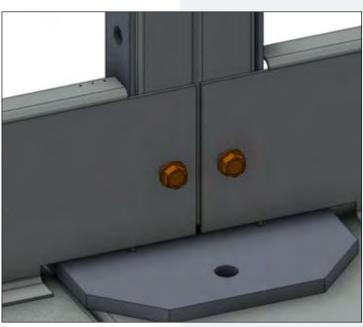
Top Perimeter Guardrail Toe Board Attachment
